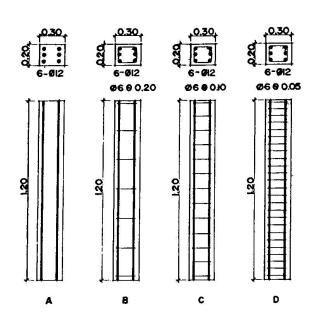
Detail of main and tie bars of reinforced concrete columns
